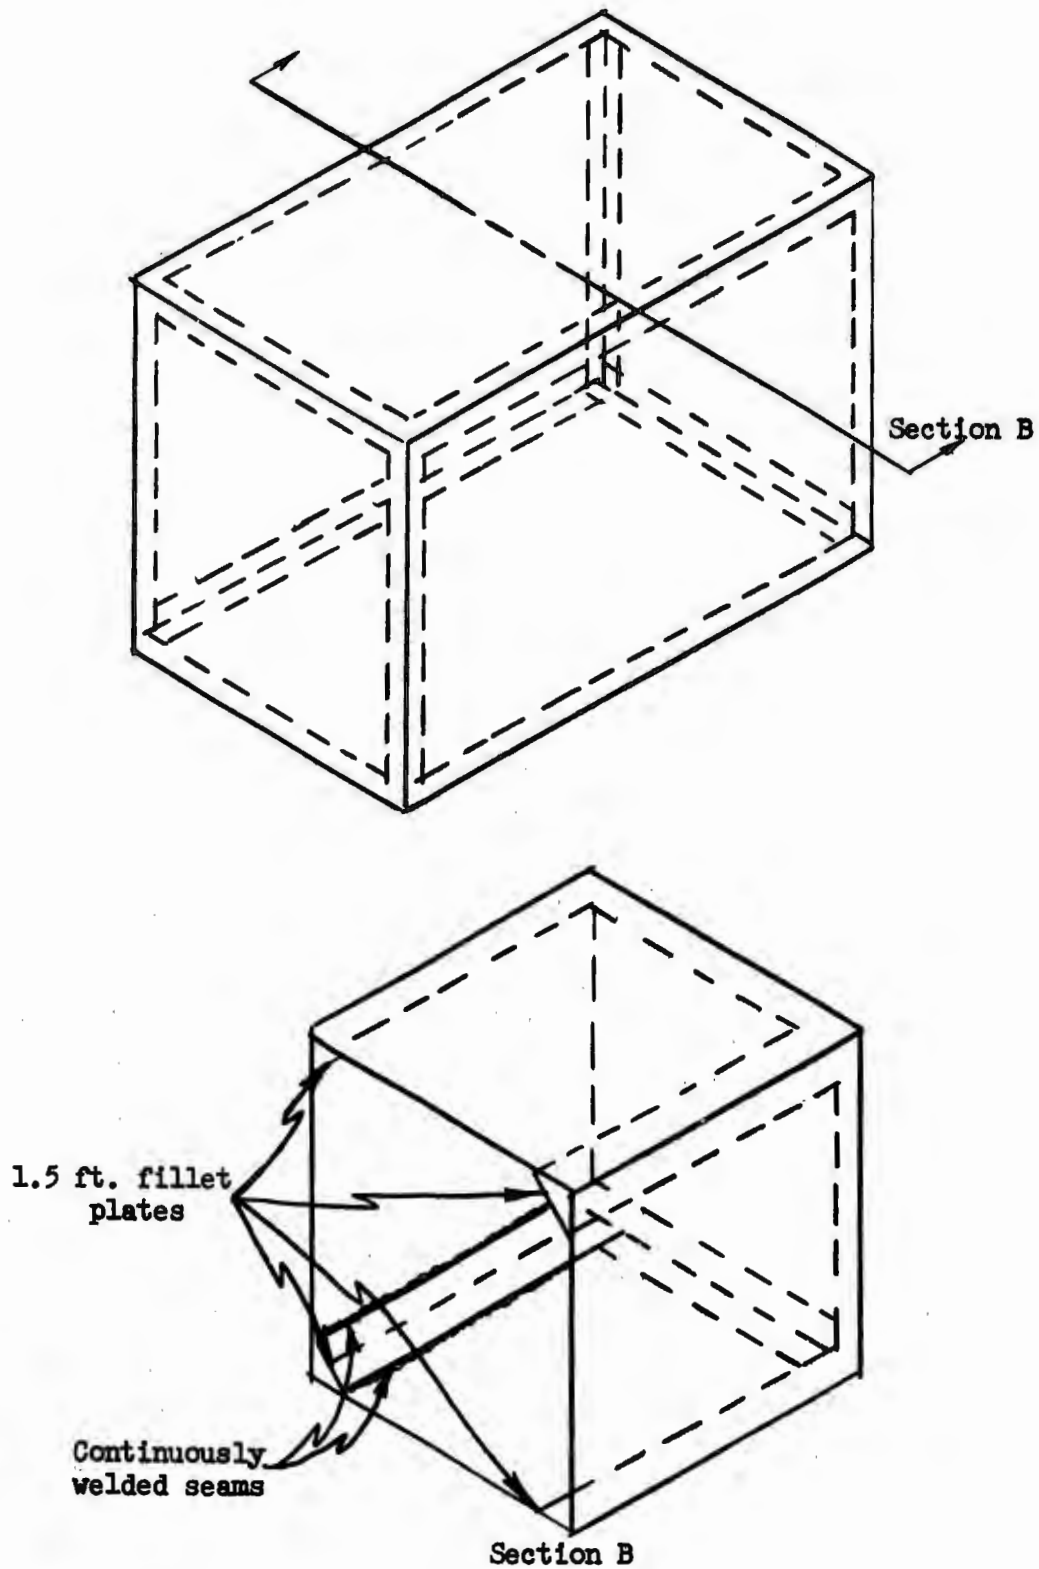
Construction Details of Metal Plate Fillets for Rooms and Buildings
